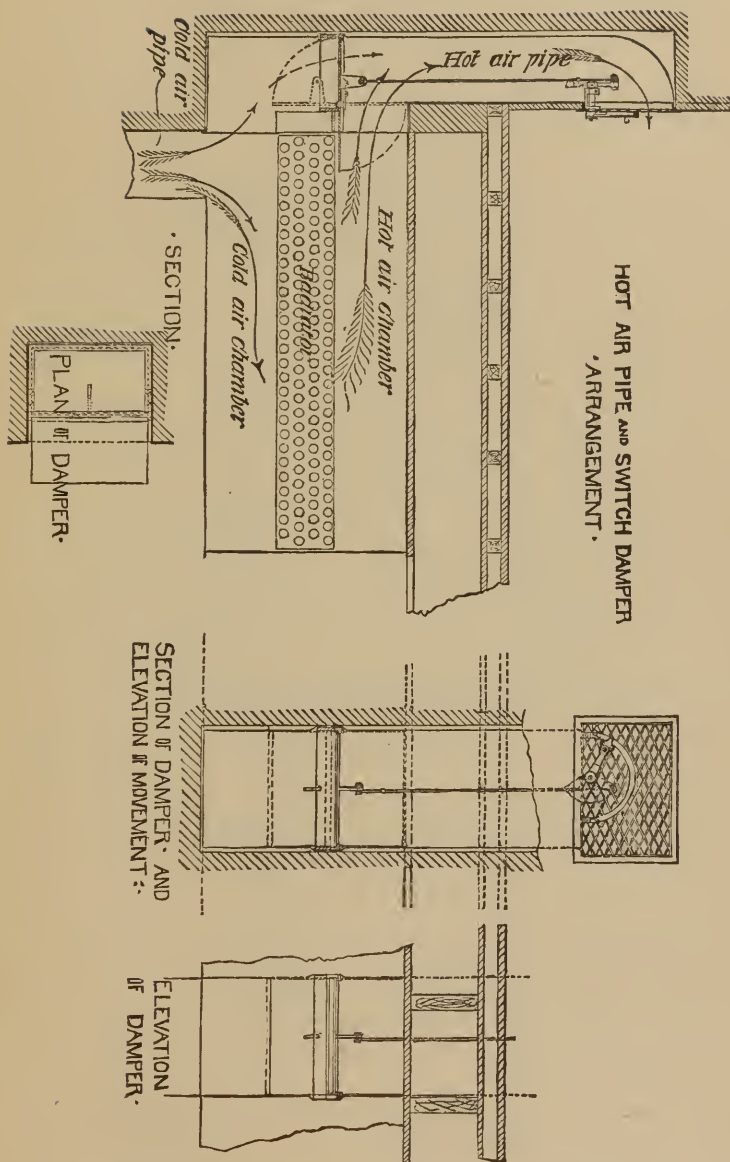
NEWTON'S SWITCH VALVE FOR STEAM-HEATING COILS.
